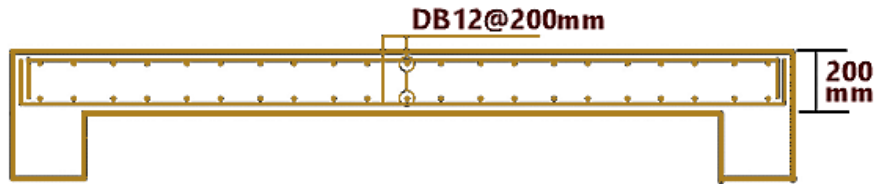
Cross Section of the 4th Floor Slab for Load Test.
